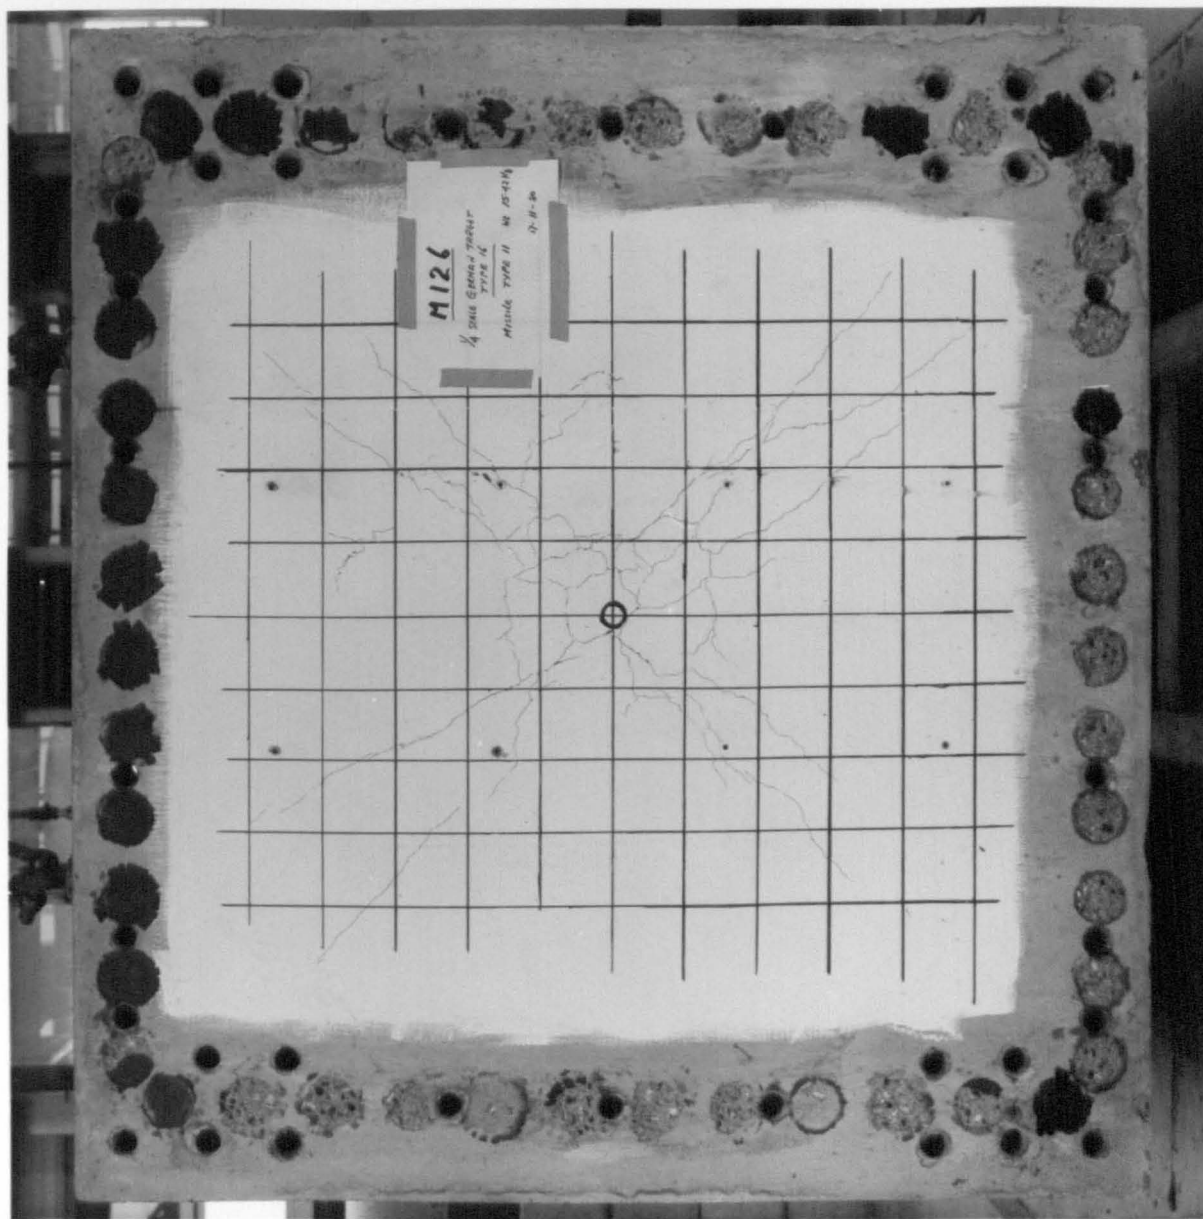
BOTTOM FACE OF TARGET B16 AFTER IMPACT TEST
